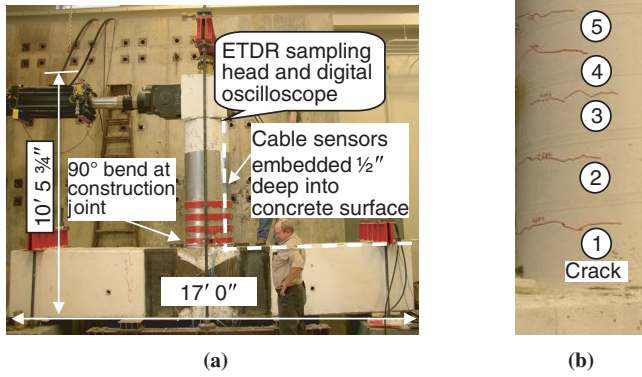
View of 1/5-scale test specimen: (a) 1/5-scale specimen and (b) flexural cracks at 58.28 kips.
